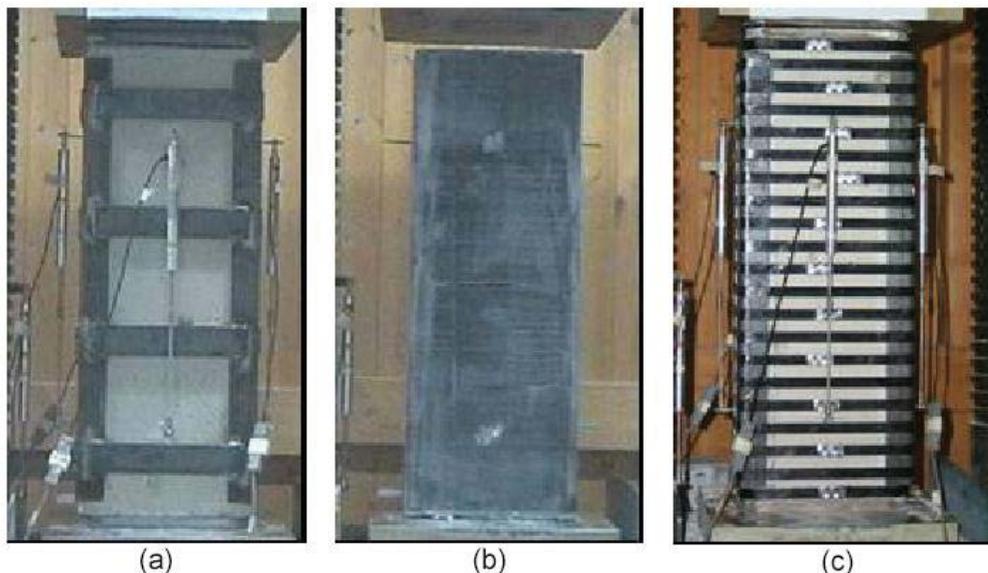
Strengthening techniques: (a) Steel Jacketing, (b) FRP encasement, (c) CAM jacketing.
